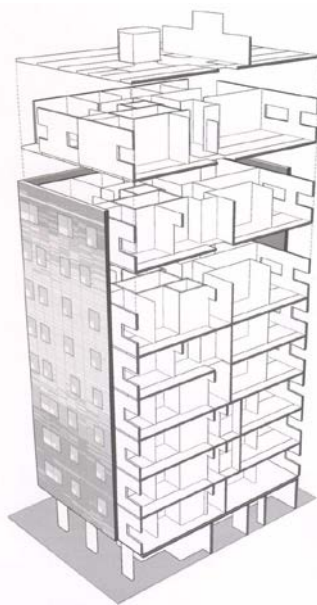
Isometric of Stadthaus Building. London, showing the closely spaced internal CLT walls
